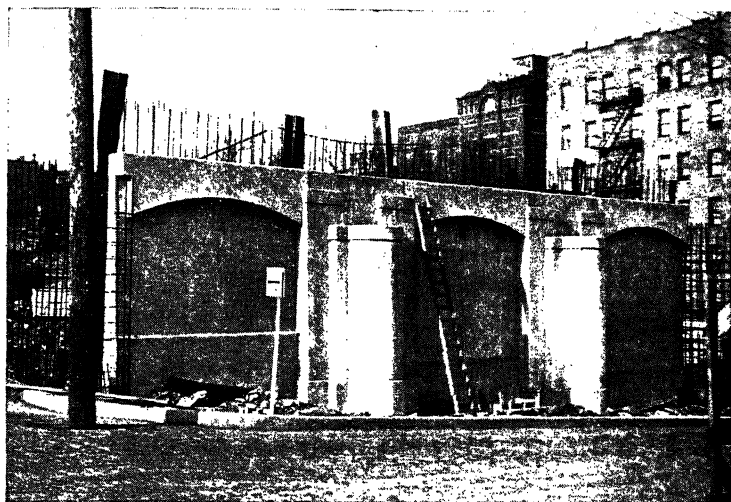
Abutment forming part of the New Jersey approach to the Lincoln Tunnel, New York City.
